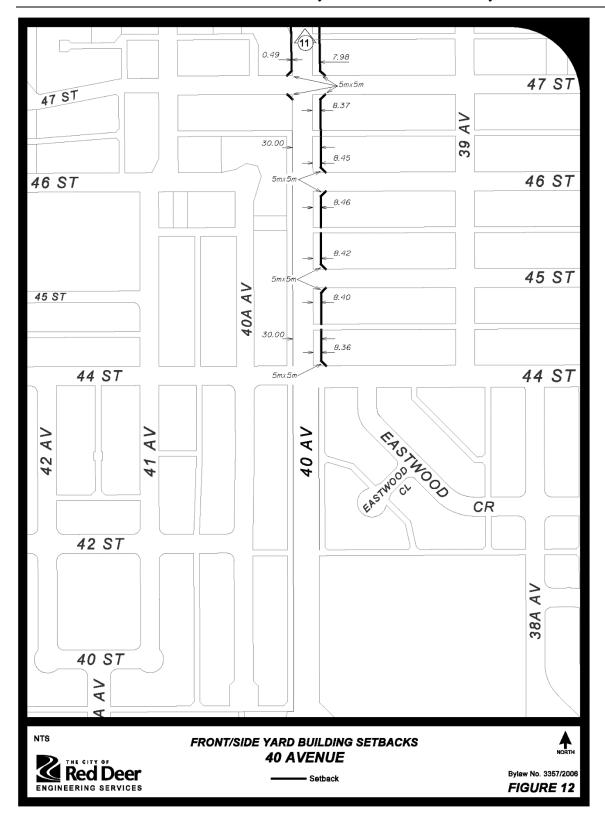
Front/Side Yard Building Setbacks 40 Avenue
